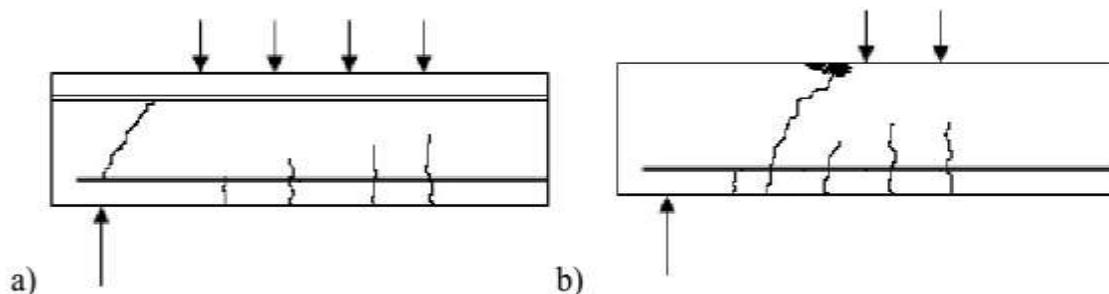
Possible shear fatigue failure modes in beams without stir ups
